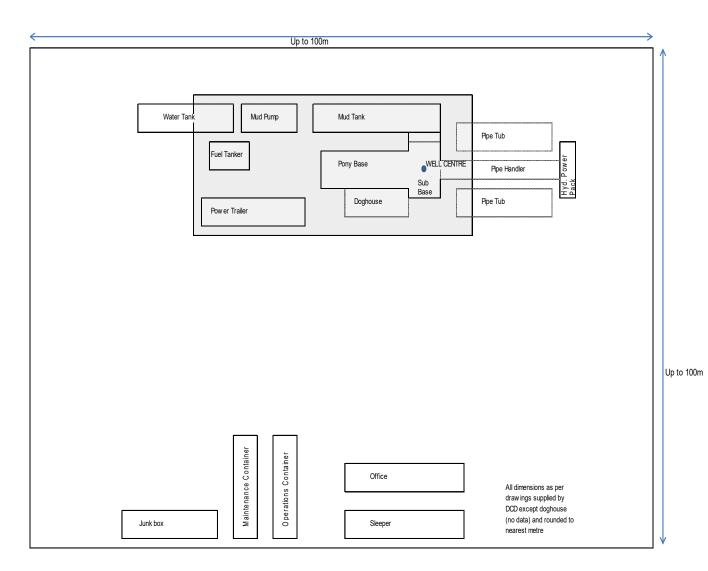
TYPICAL DRILL SITE LAYOUT (NOT TO SCALE)
